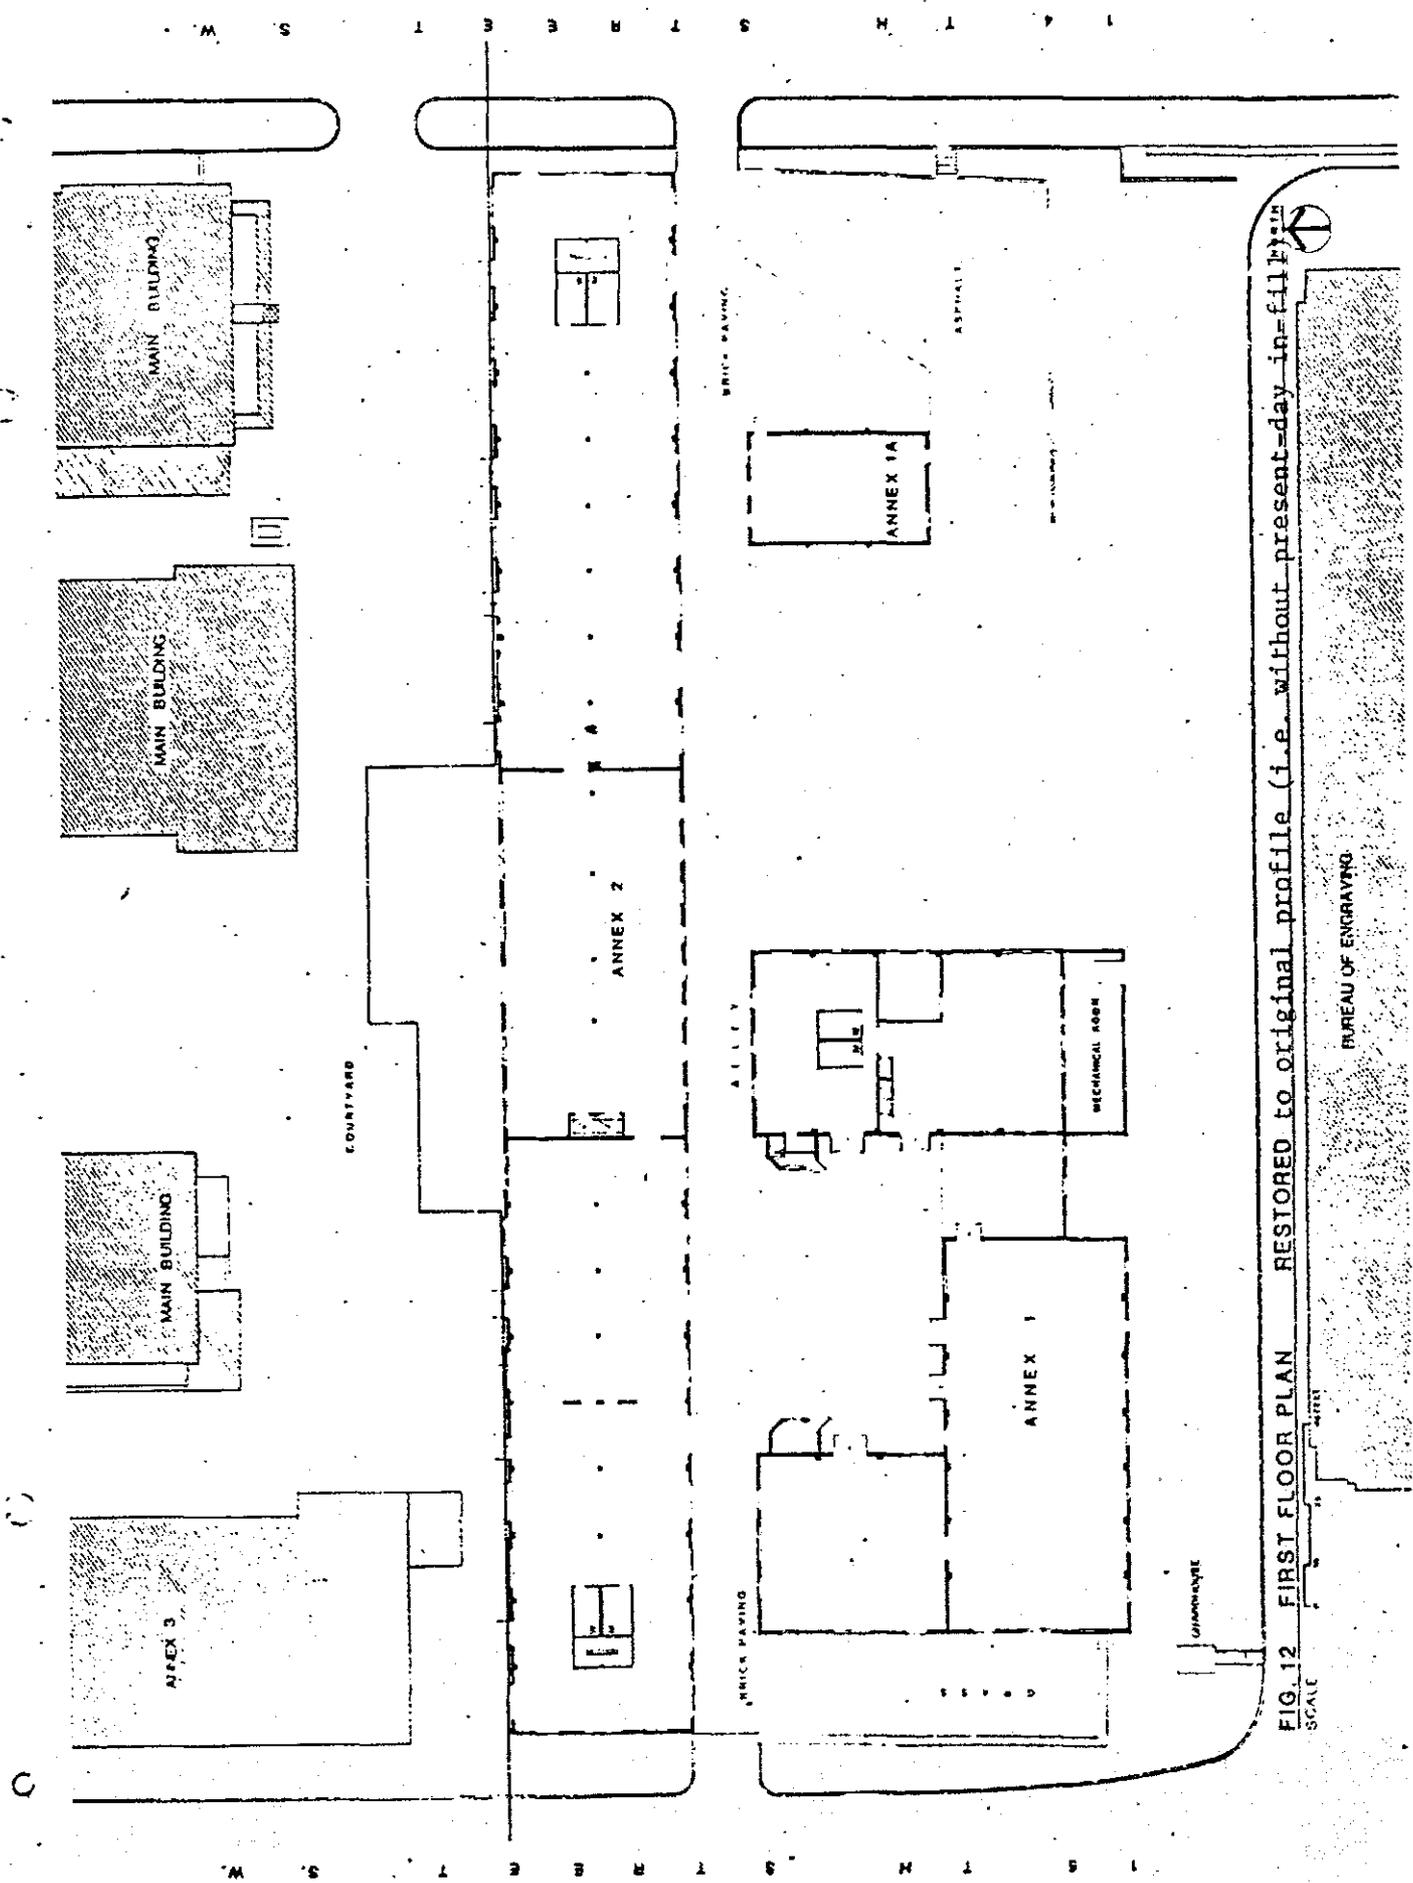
FIRST FLOOR PLAN RESTORED TO ORIGINAL PROFILE (i.e. without present-day in-fill)
